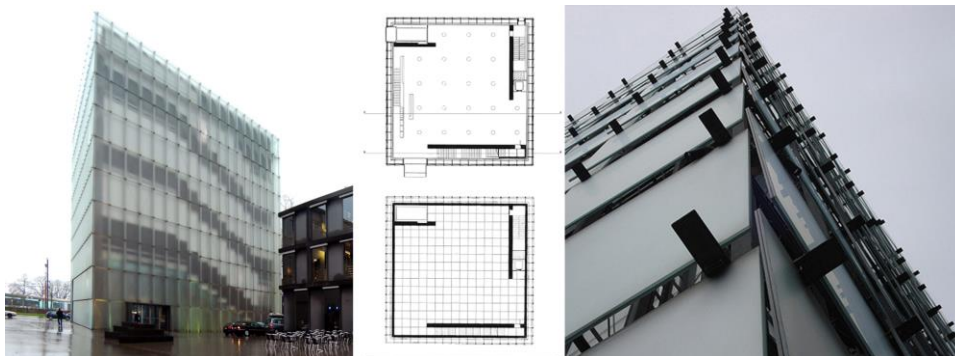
Boxy reduced form; first and galleries floor plan; glass facade detail - texture
